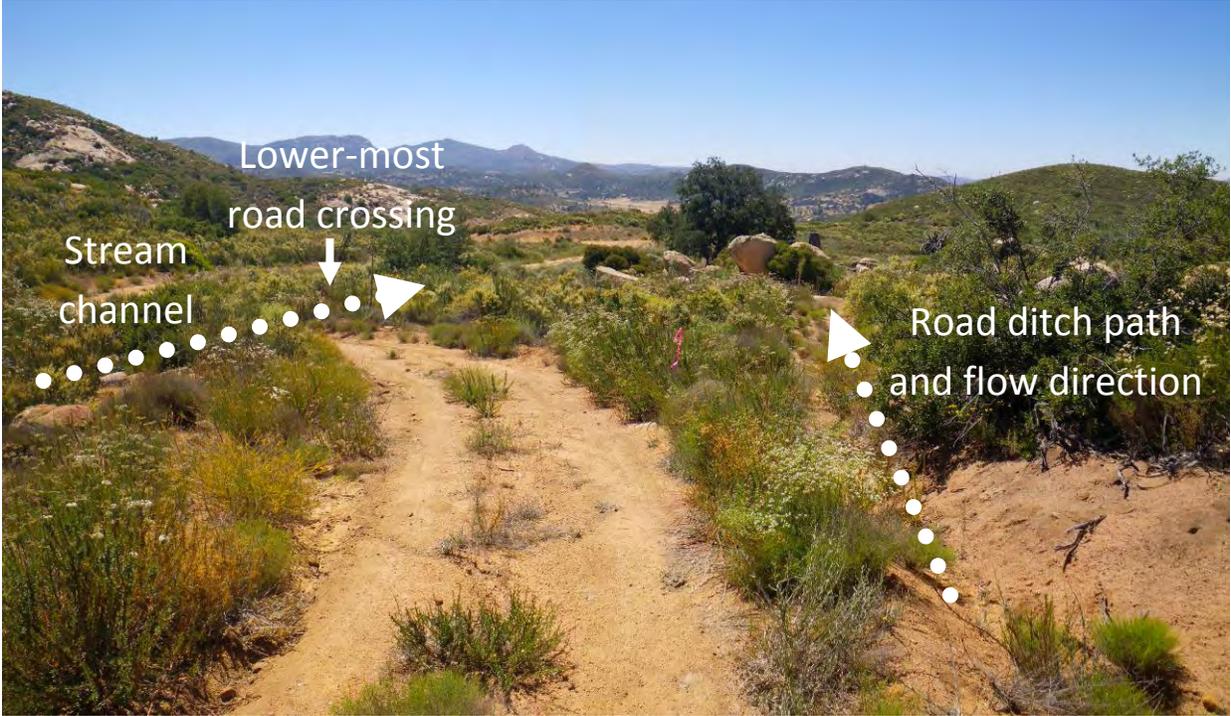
At Site 1 looking down-gradient along the roadway with the inboard ditch diverting away to the right and the stream channel crossing on the left.
